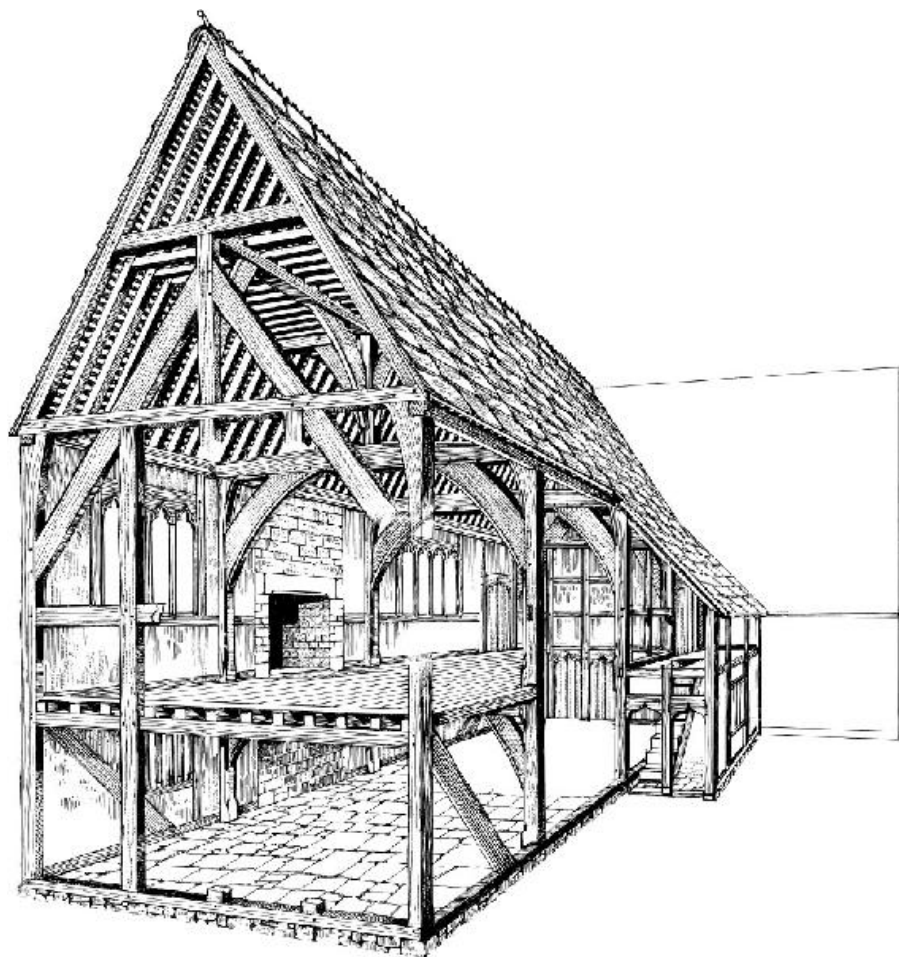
Axonometric reconstruction by Bryan Byron of the primary phase of 20 Church Street
